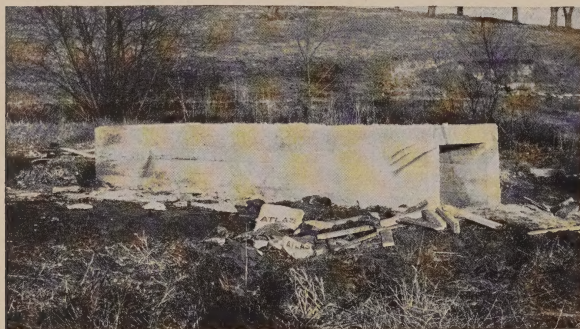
At left: Concrete box culvert under construction before road fill is made. Roadway will afterwards be filled over the top of this culvert. It is always best to provide end walls as shown in the drawing, Figure 155.
